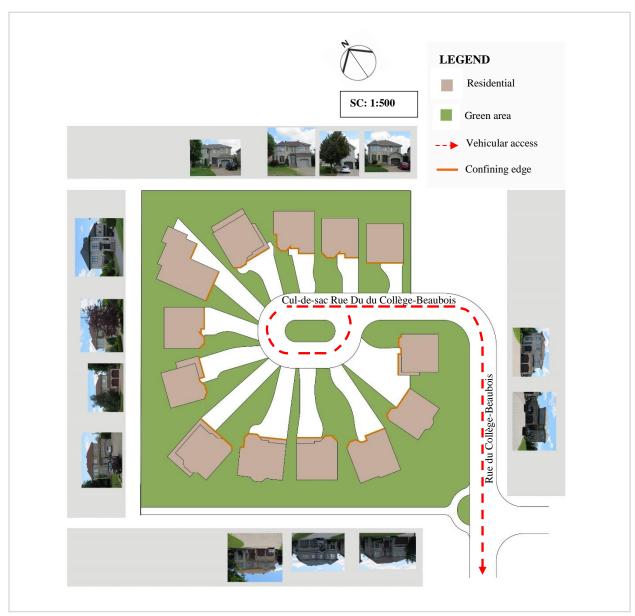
Cul-de-sac Rue Du Collège-Beaubois, Site plan
